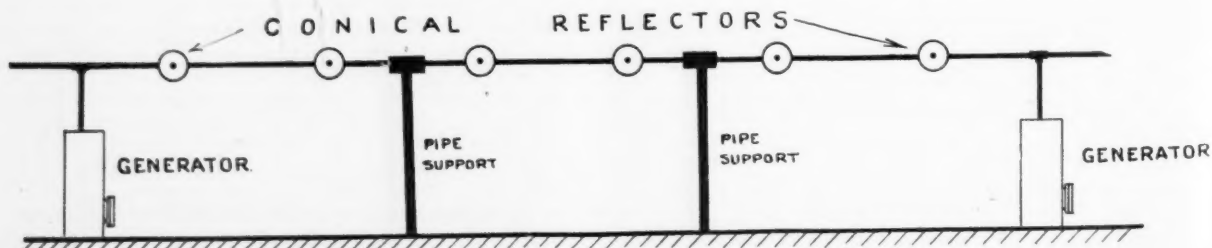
Showing Acetylene-Lighting Equipment for Railway Work.
